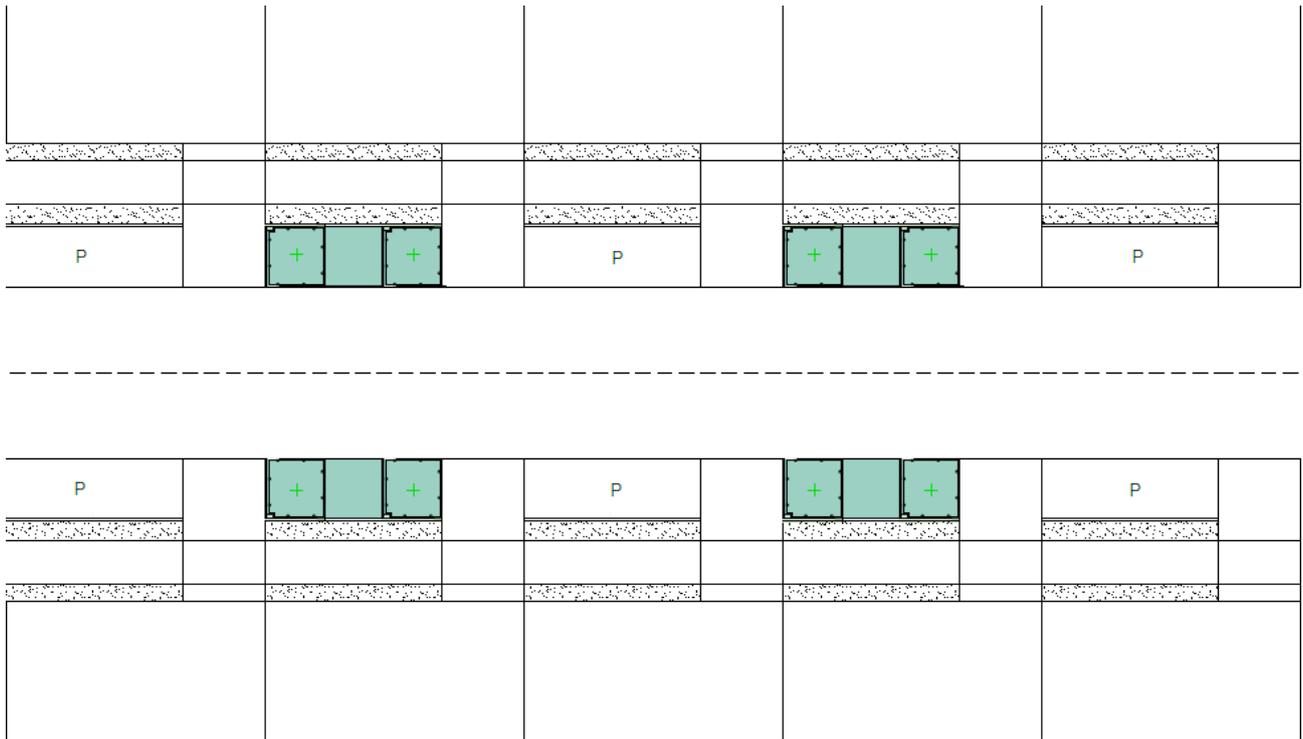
Preferred street tree and parking arrangement for local roads in subdivisions with narrow front-loaded lots
